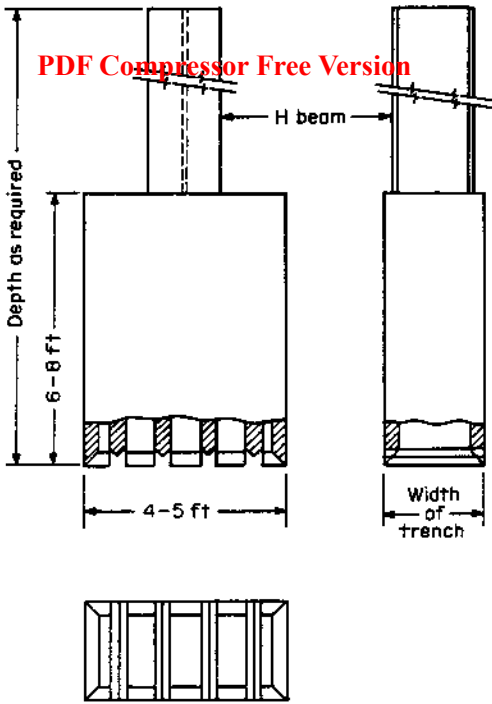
Typical chisel details for breaking embedded boulders in site excavations (Xanthakos 1979).
